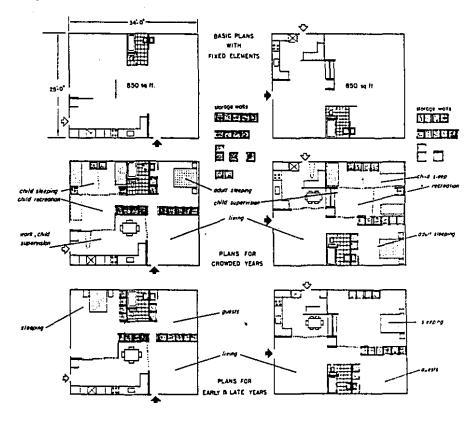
FLEXIBLE FLOOR PLANS source: A.F. 1950, April, 129.
